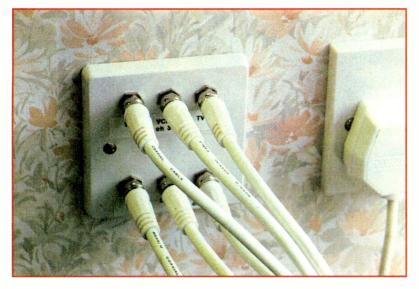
An installed six-way plate. The flyleads have moulded plugs.
